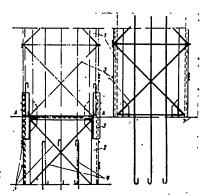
Rigid Welded Steel Skeleton Reinforcement of a Column.
